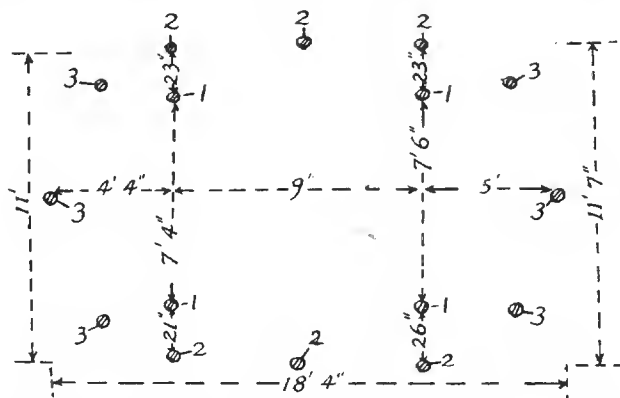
Ground plan of cooking house (*utupoto* type): 1, supporting posts; 2, wall posts of middle section; 3, wall posts of rounded end.
